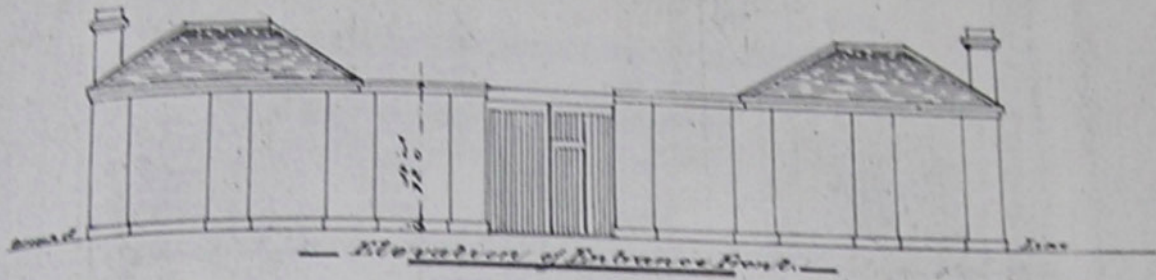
H. Ginn, Elevation & Section drawings of proposed additions to South Geelong Watch House, n.d. [c.1849]. Source: Book of Plans by Clerk of Works Henry Ginn, VPRS 4107/P1 Unit 1, Public Record Office Victoria.
